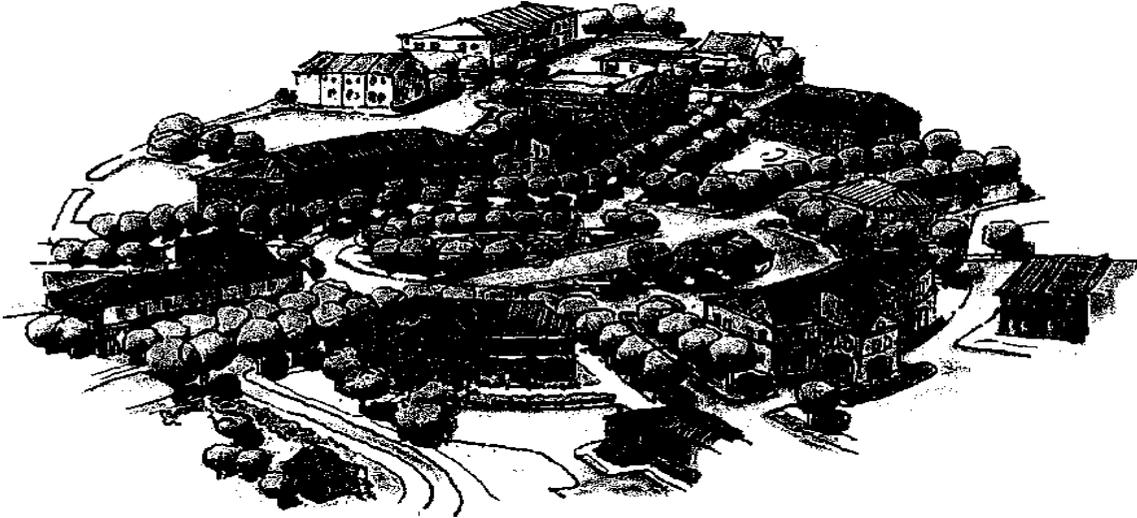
Aerial Perspective of proposed Owings Town Center. View is taken from east overlooking the proposed circle at the intersection of Chesapeake Beach Road and Thomas Avenue.
